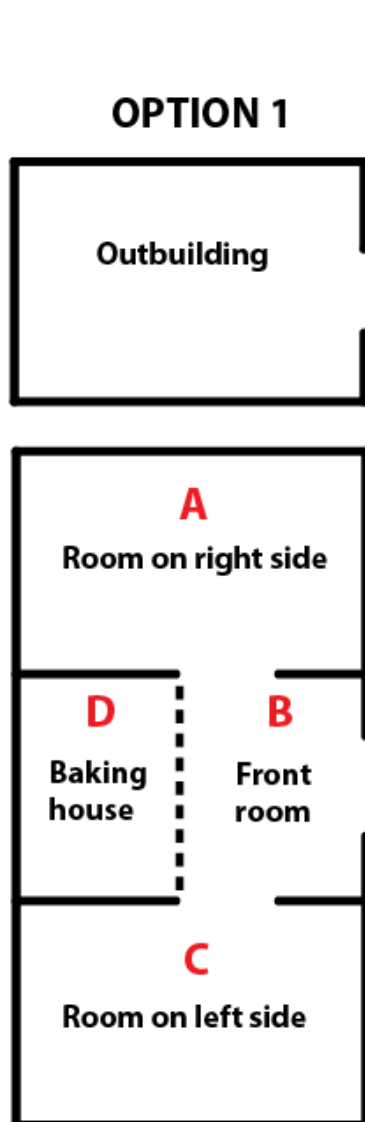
Option 1. A floor plan of Blaauwbergsvally (Breytenbach, 2016).
